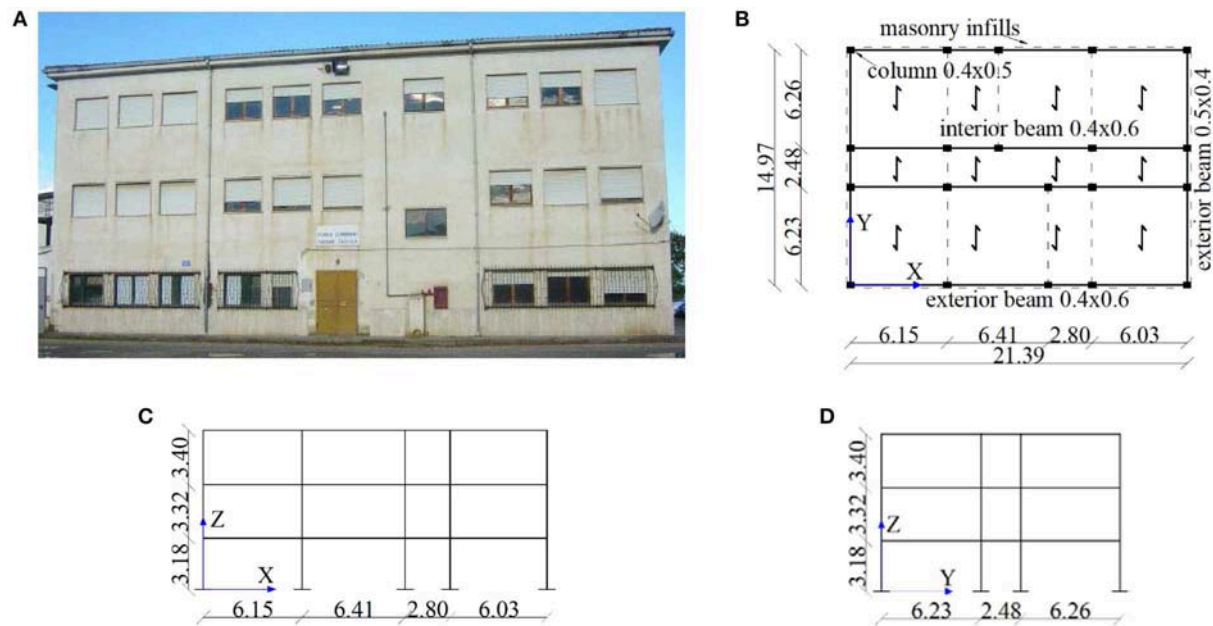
| Original Collina-Castello school in Bisignano (units in m). (A) Front view. (B) Plan. (C) Longitudinal perimeter frame. (D) Transversal perimeter frame.
